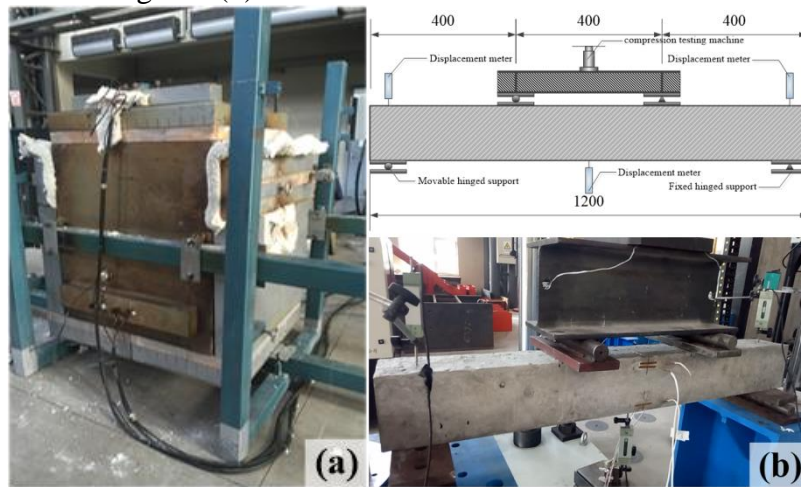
Test equipment. (a) Fire equipment (b) Loading equipment
